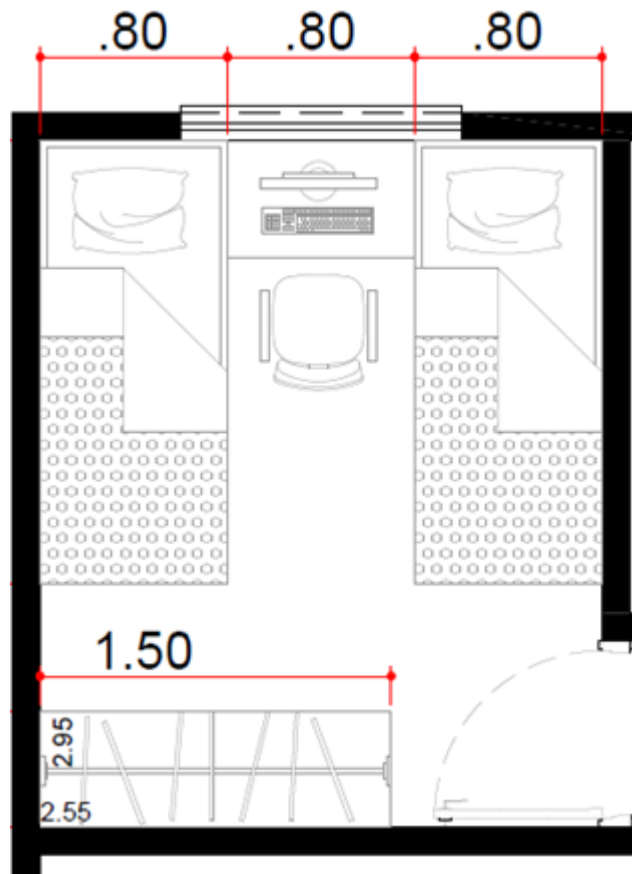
Analysis of the floor plan of bedroom 2 in relation to the Caixa requirements.
